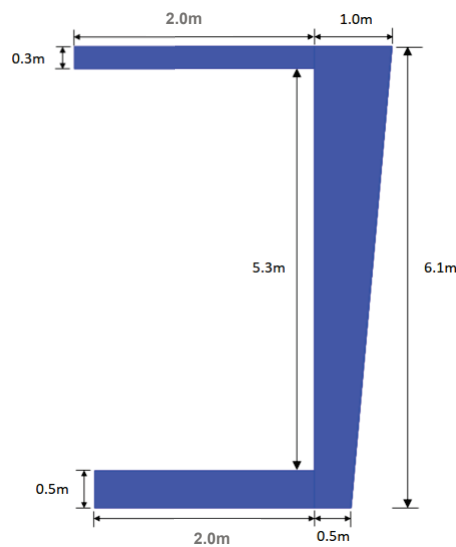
Retaining Wall Idealised Structure for SAP model
